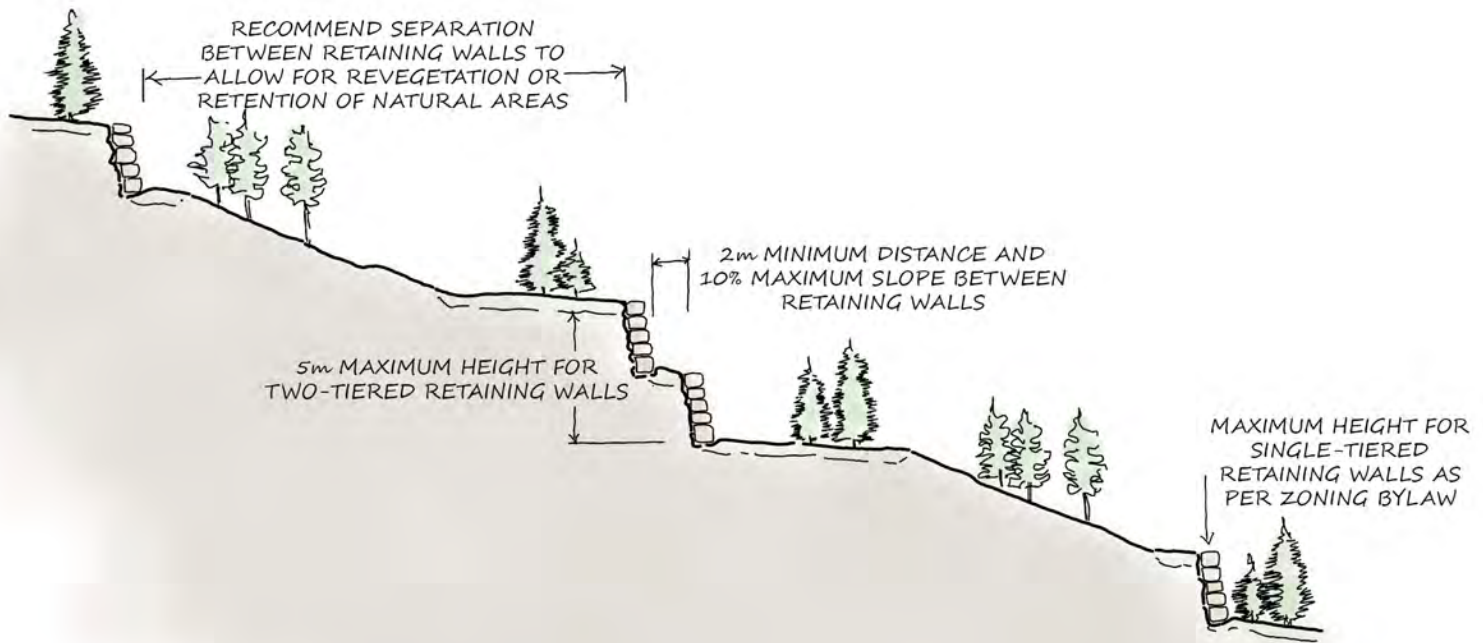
Diagram indicating Grading and Retaining requirements for a retaining wall [See 4.9.5.22 & 23]
